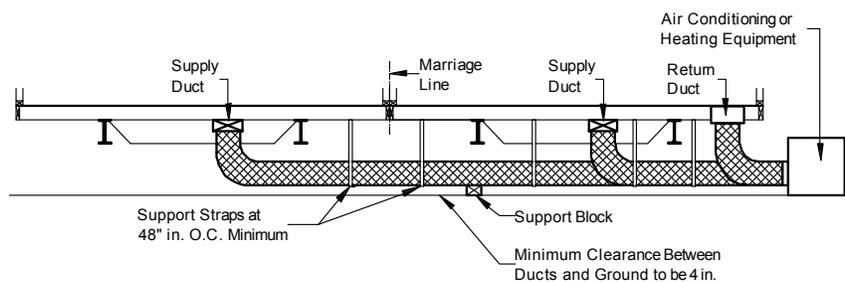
Ducts connecting exterior heating and/or cooling equipment to the home
